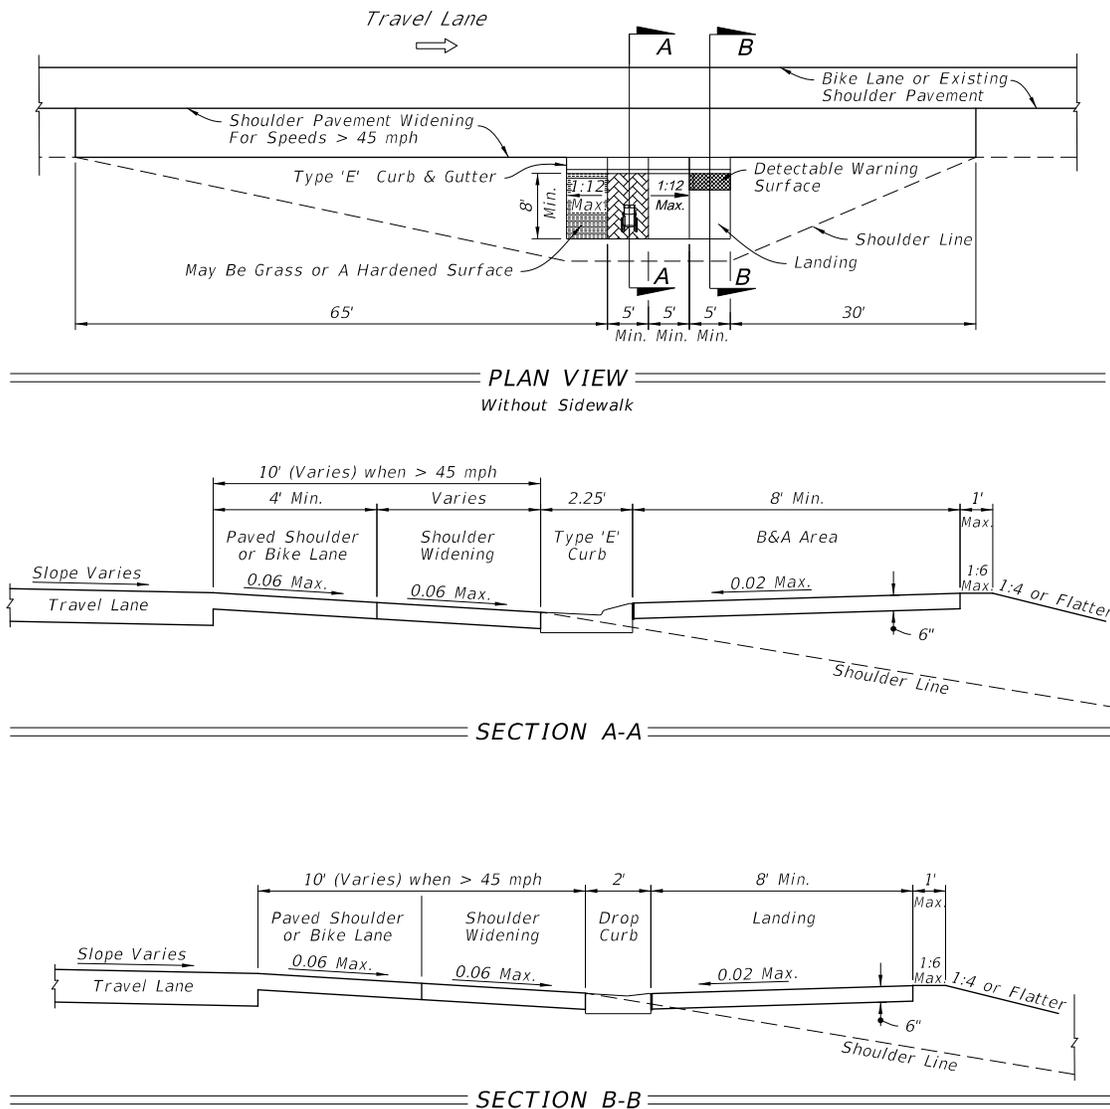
Accessible Boarding and Alighting Area for Flush Shoulder Roadways with Connection to Roadway
